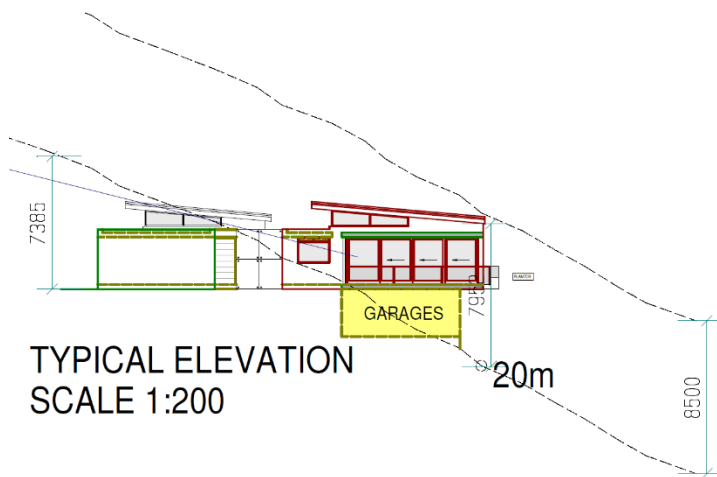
Cross-section showing elevation and required cut for main dwelling located at the southwest corner of the property.
